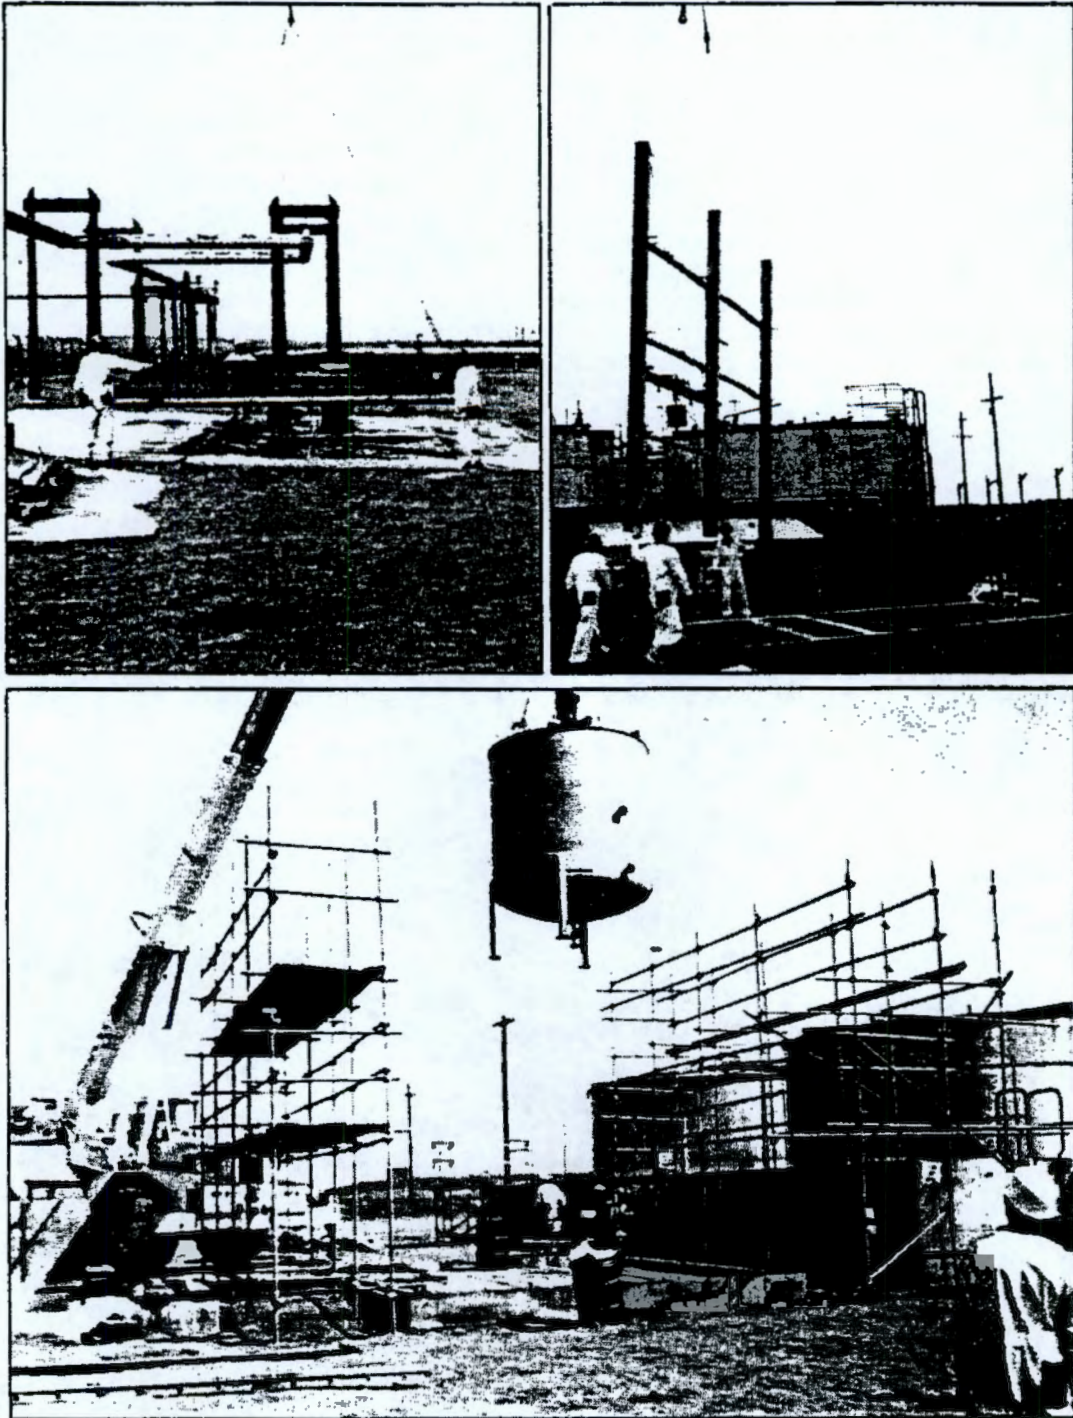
Final Dismantling Operations at 205-S. (Clockwise from left) lowering the roof onto a plastic sheet; hoisting sidewall frame sections; and lifting the chemical tank from the building pad.
